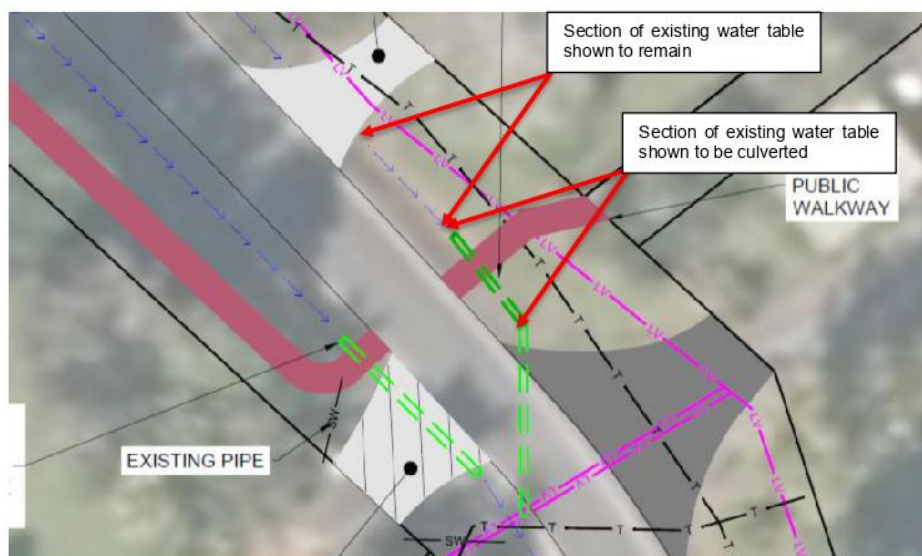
Extract of design drawings showing section of existing water table to be culverted and section to remain
